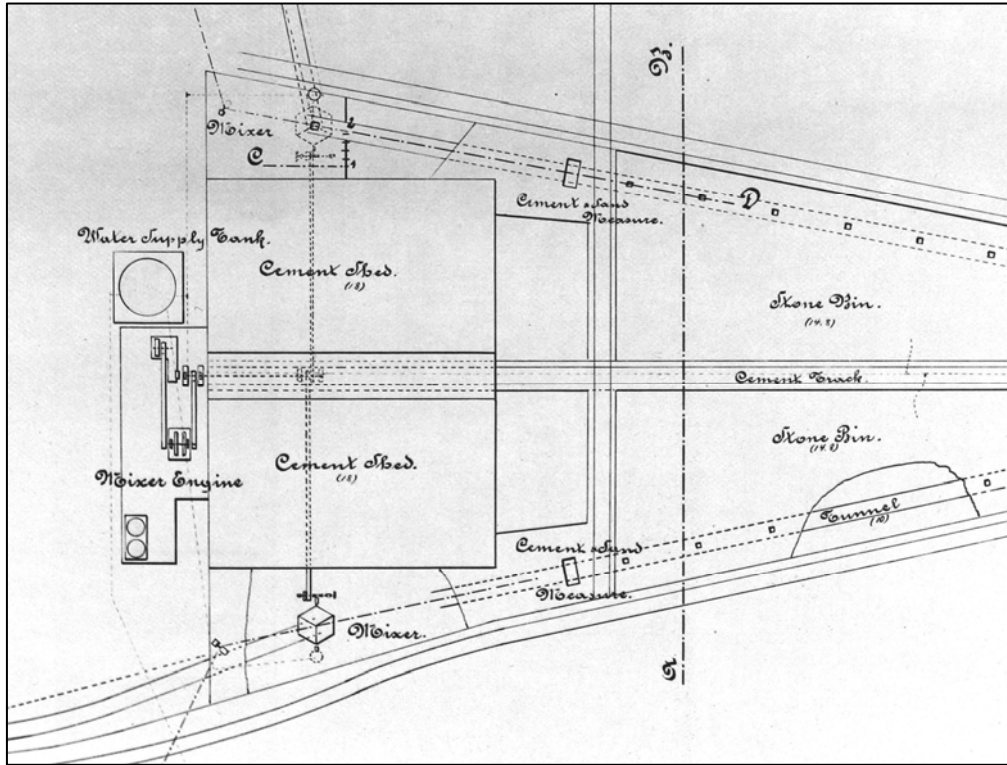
"Gun Lift Battery No. 1, at Sandy Hook, N. J." Detail of concrete plant plan. Prepared under the direction of 1st Lt. J.G. Warren, June 30, 1892.
